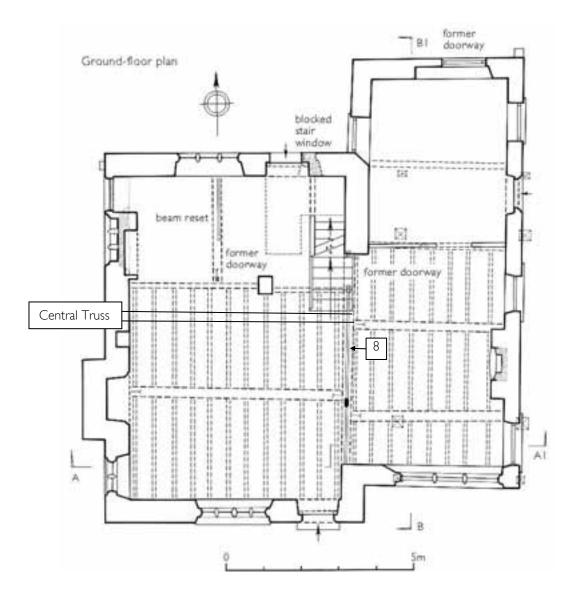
Ground-floor plan of Manningham Old Manor House, showing the location of sample 8 and the position of the central truss in the cross-wing roof
